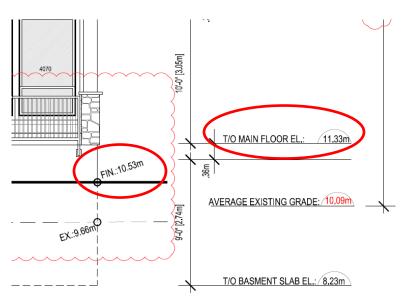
August 2023 elevation plan showing main floor and finished grade elevations.
